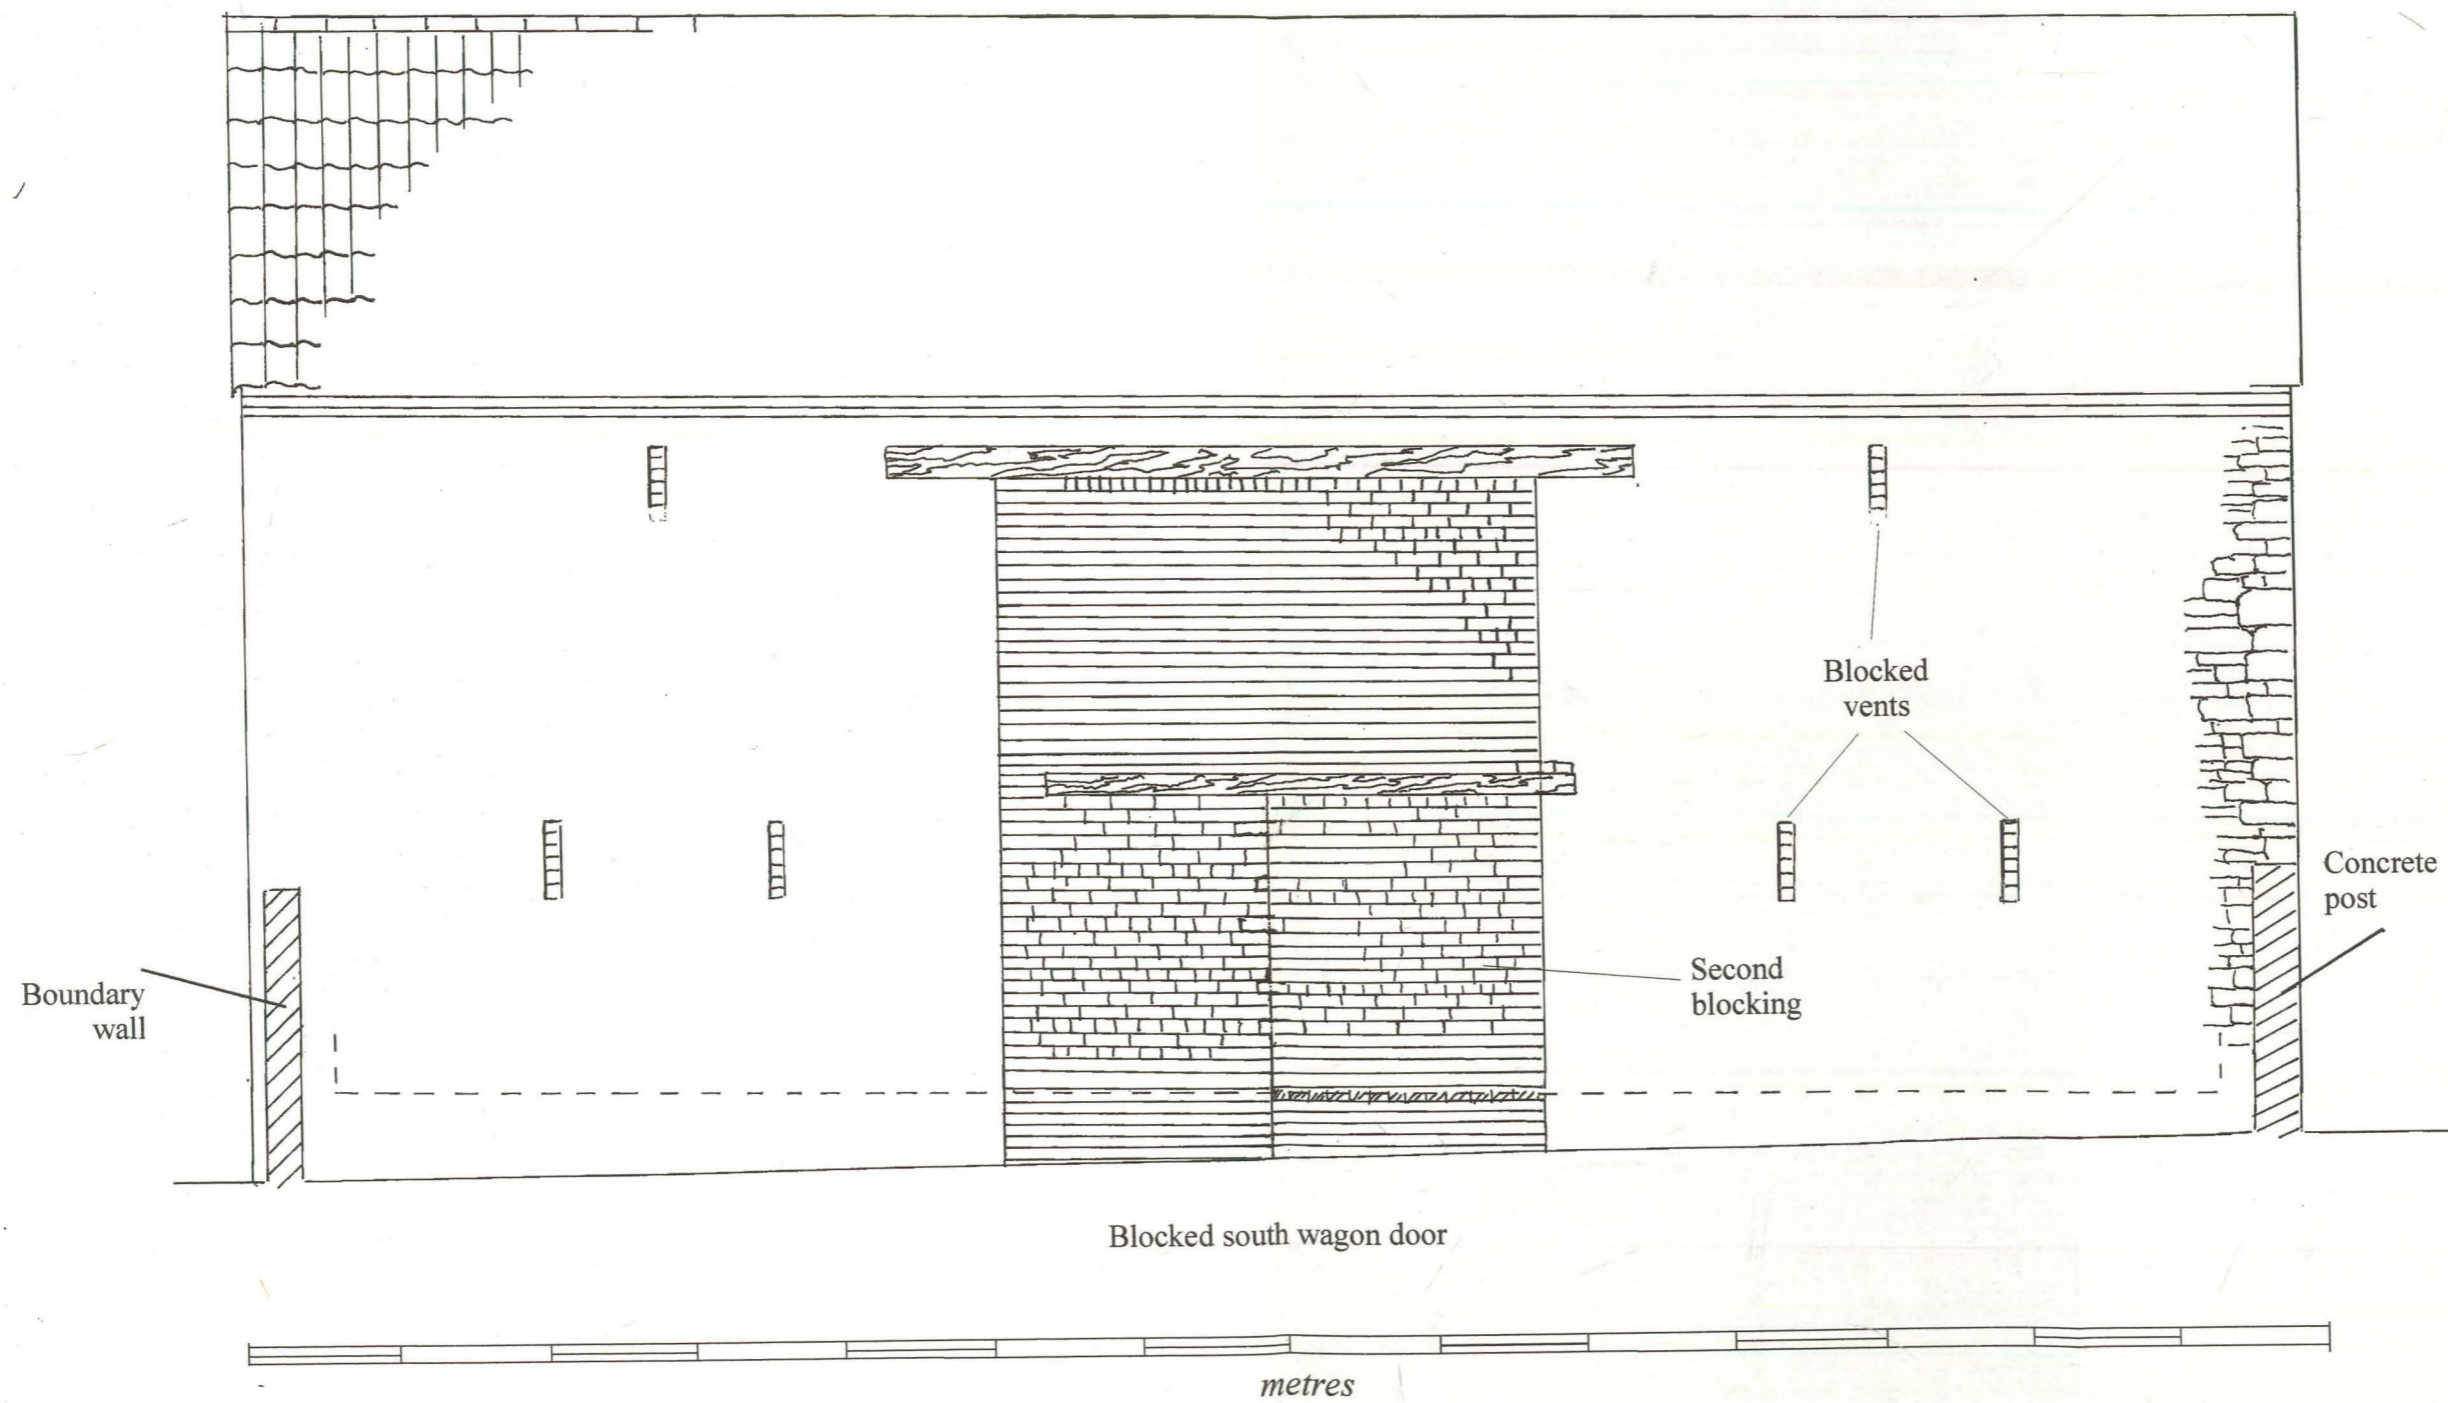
Building 7. Stone barn south elevation (M. Clark).
